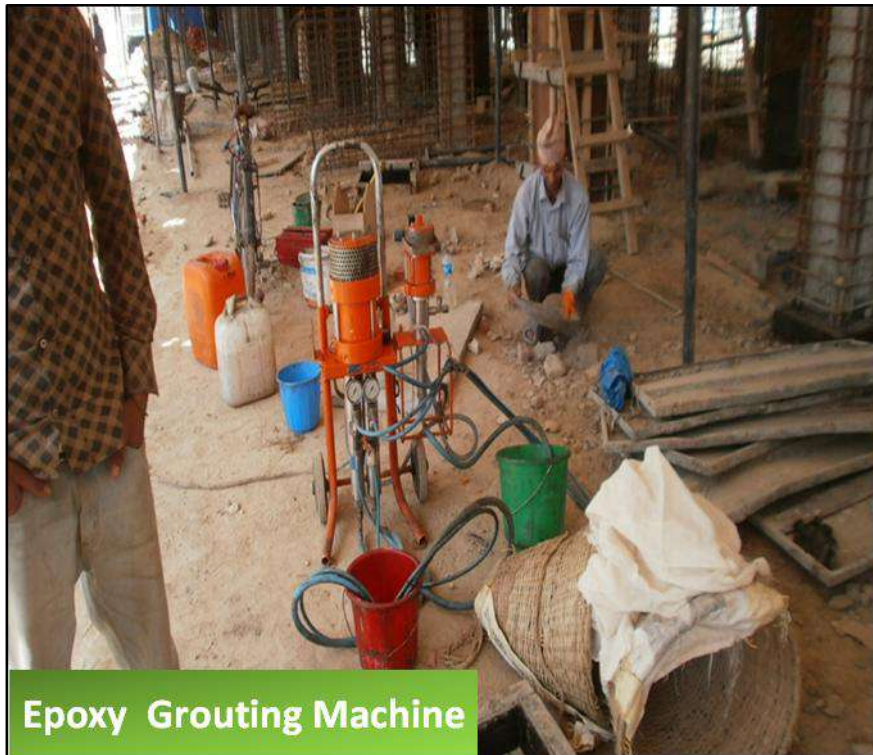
Epoxy grouting machine (source: MRB & Associates)
